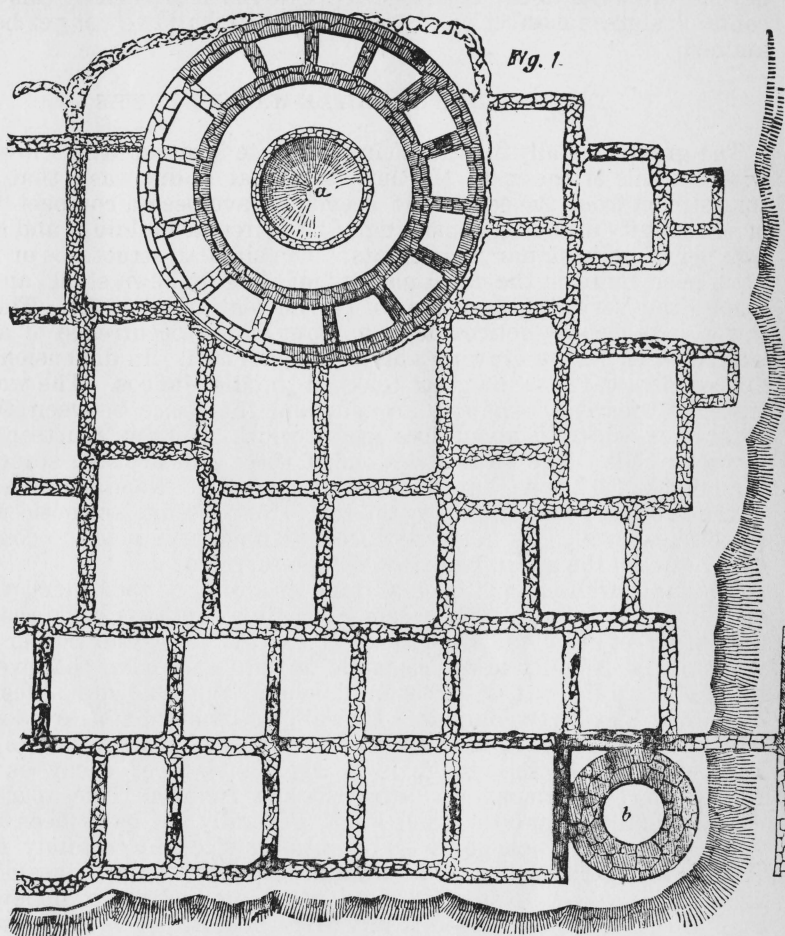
#### PLATE VIII.—THE TRIPLE-WALLED TOWER.
